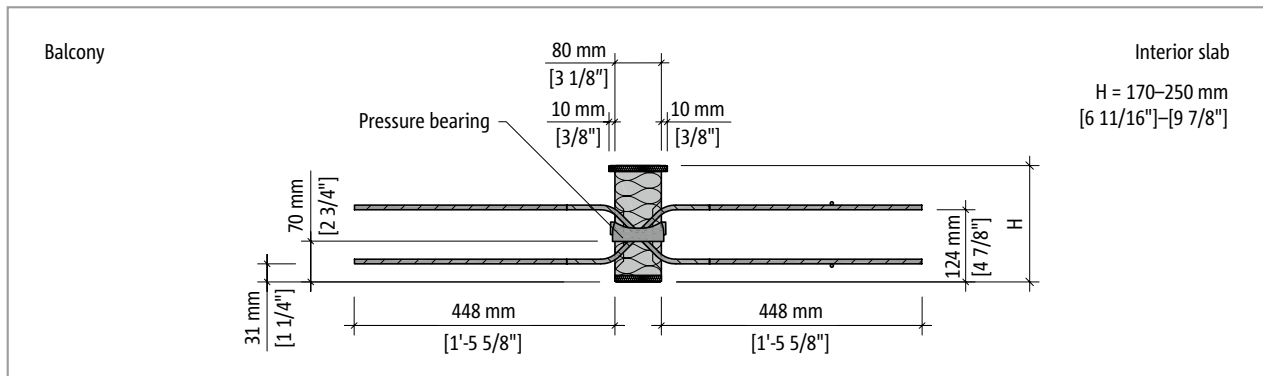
Schöck Isokorb® T Type CQ-VV6: Product cross-section
